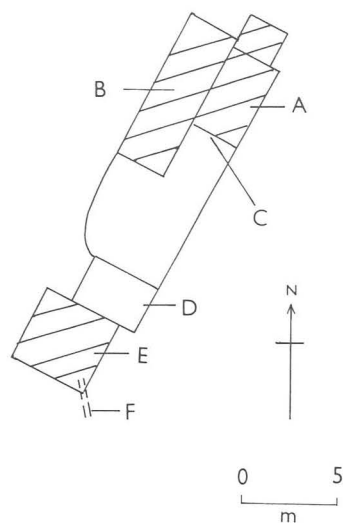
Long Cross, Shaftesbury: plan of Brick-Kiln site enlarged from County Map of Dorset, 1902. 1:2,500. A: Site of Scotch Kiln. B: Firing Shed and Coal Store. C: Wicket or Doorway for Loading, with Blocked-Up Fire-Holes either side. D: Southern Firing Shed for Suffolk Kiln. E: Site of Greensand Cottage and/or Earlier Suffolk Kiln. F: Brick Arch and Tunnel (underground).
